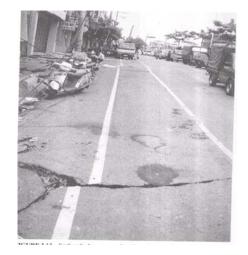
Surface fault rupture and roadway damage associated with the Chi-chi earthquake.
